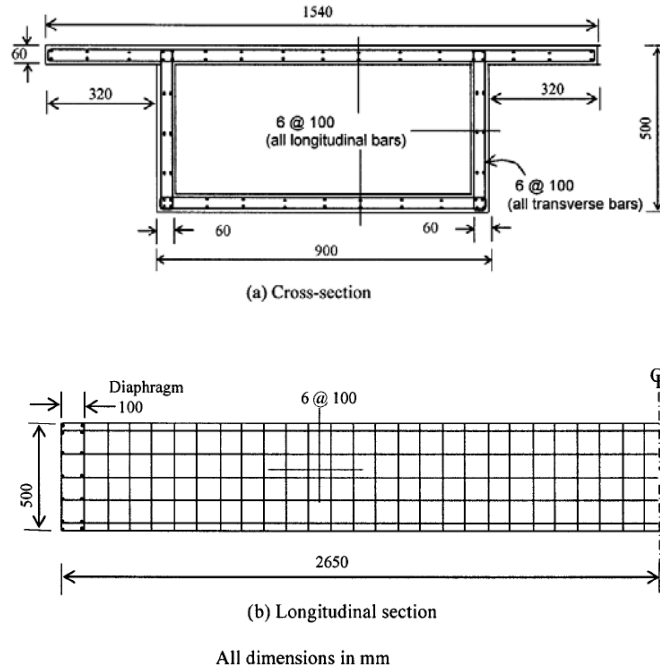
Cross section and the details of reinforcement [Kuiran and Menon, 2007]
